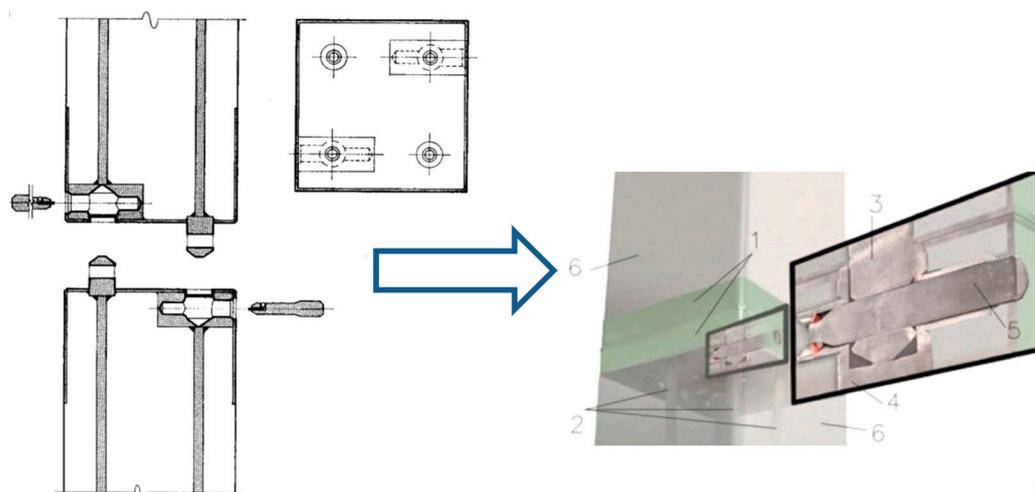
Principal design of pin connection in precast concrete joint reinforced concrete piles [8].
